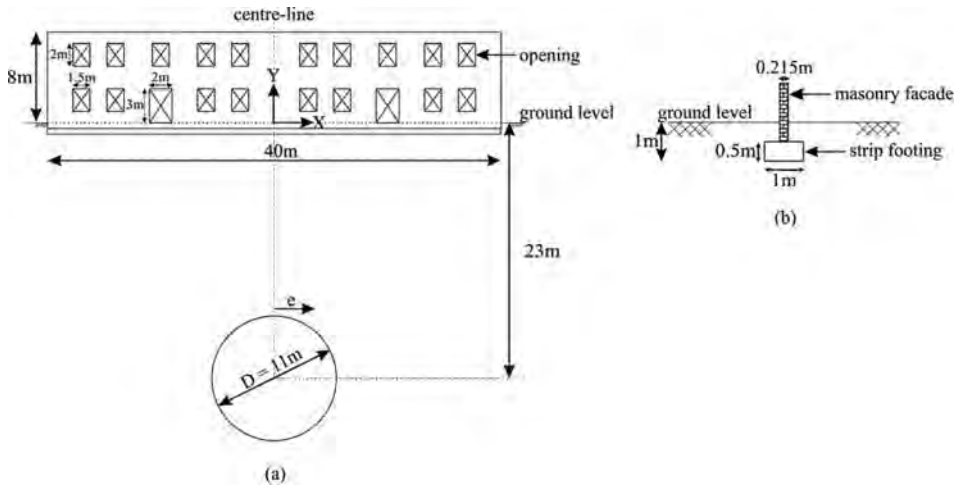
Building facade, footing and tunnel configuration adopted for the case study (not to scale): (a) facade and single tunnel geometry, (b) footing cross-section detail (modified from Yiu et al. 2017).
